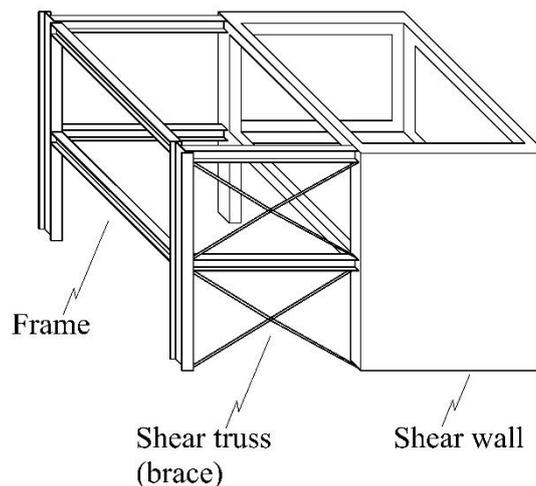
Rigid frame, shear truss (brace), and shear wall
